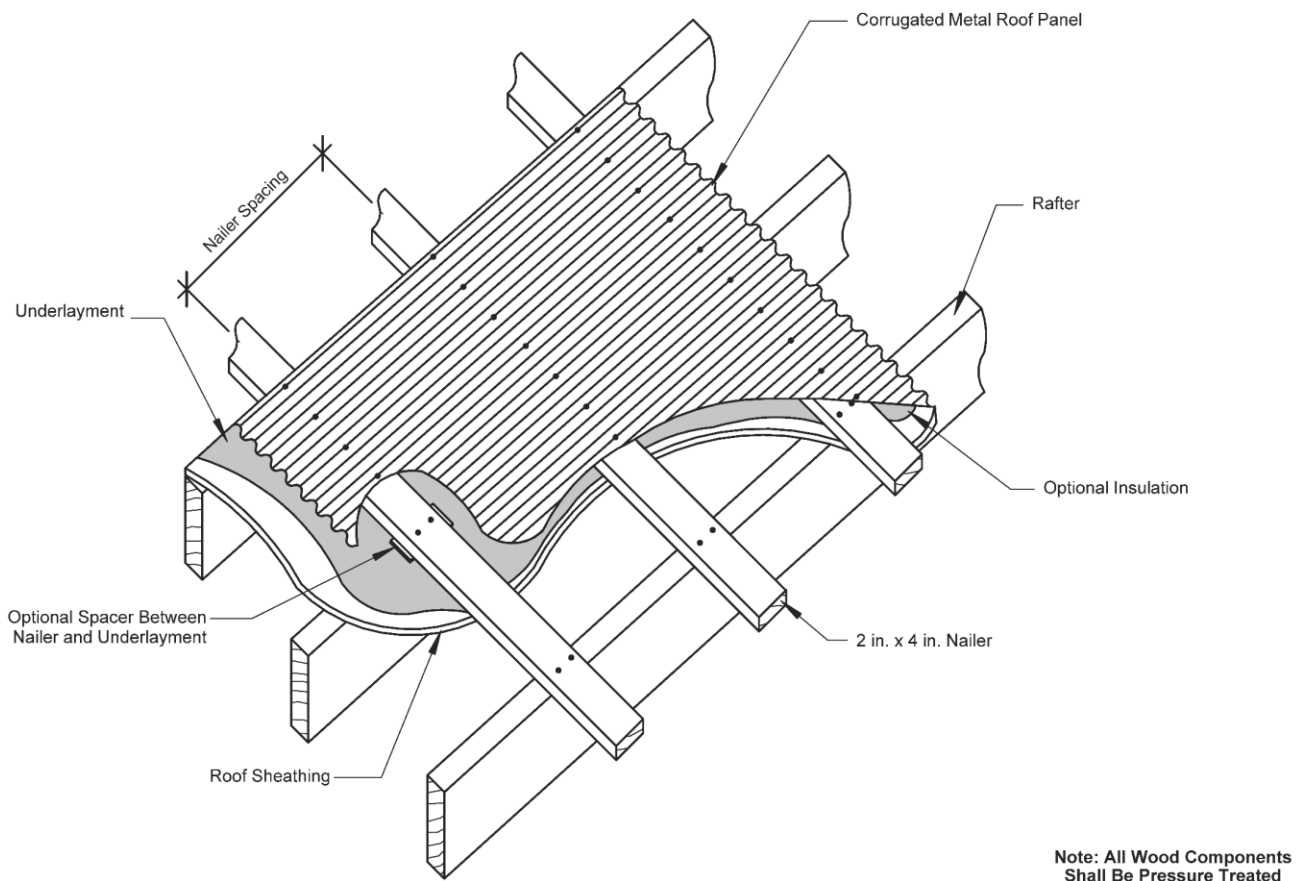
Typical underlayment installation. From *Construction Information for a Stronger Home, 4th edition* (U.S. Virgin Islands Department of Natural Resources, 2018), Sheet S-16.
